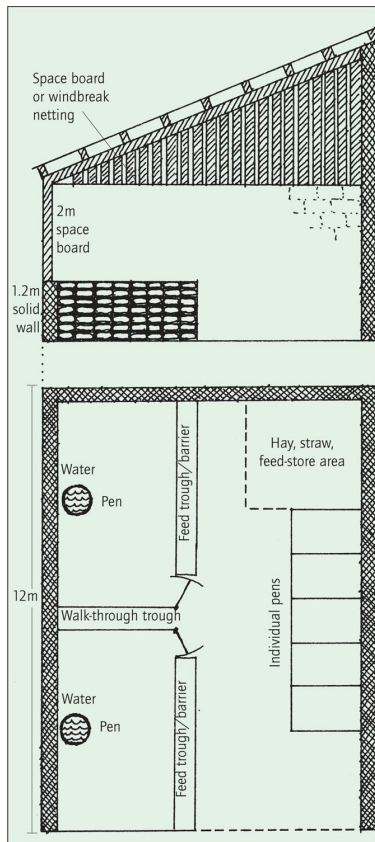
A simple lean-to shelter for winter housing or lambing, with a plan of a suitable layout. Pens can be subdivided, for smaller
